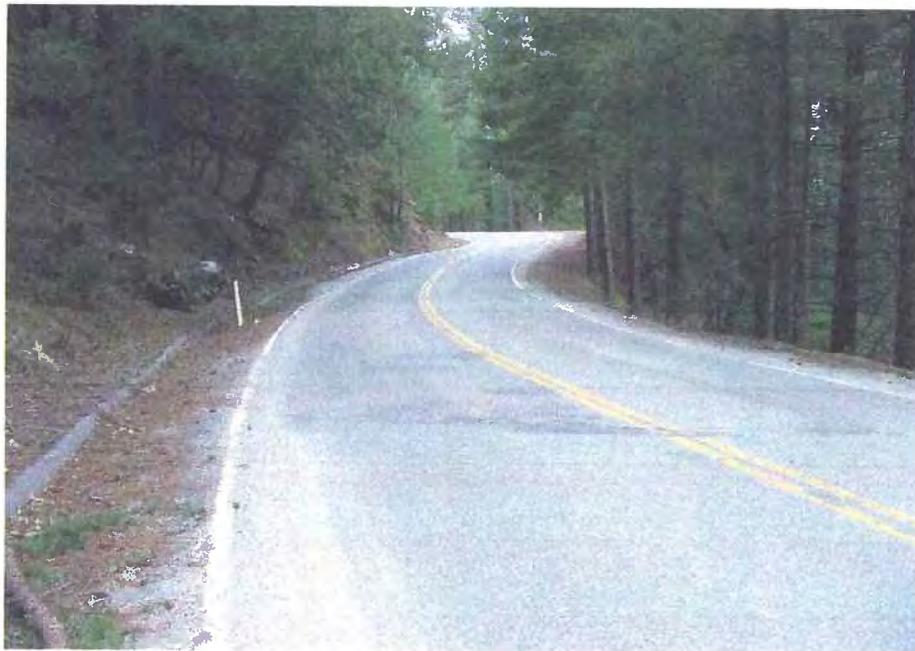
MP 2.65-2.73 - Area of past mine adit raise failure has been repaired and covered, east lane, looking north.
